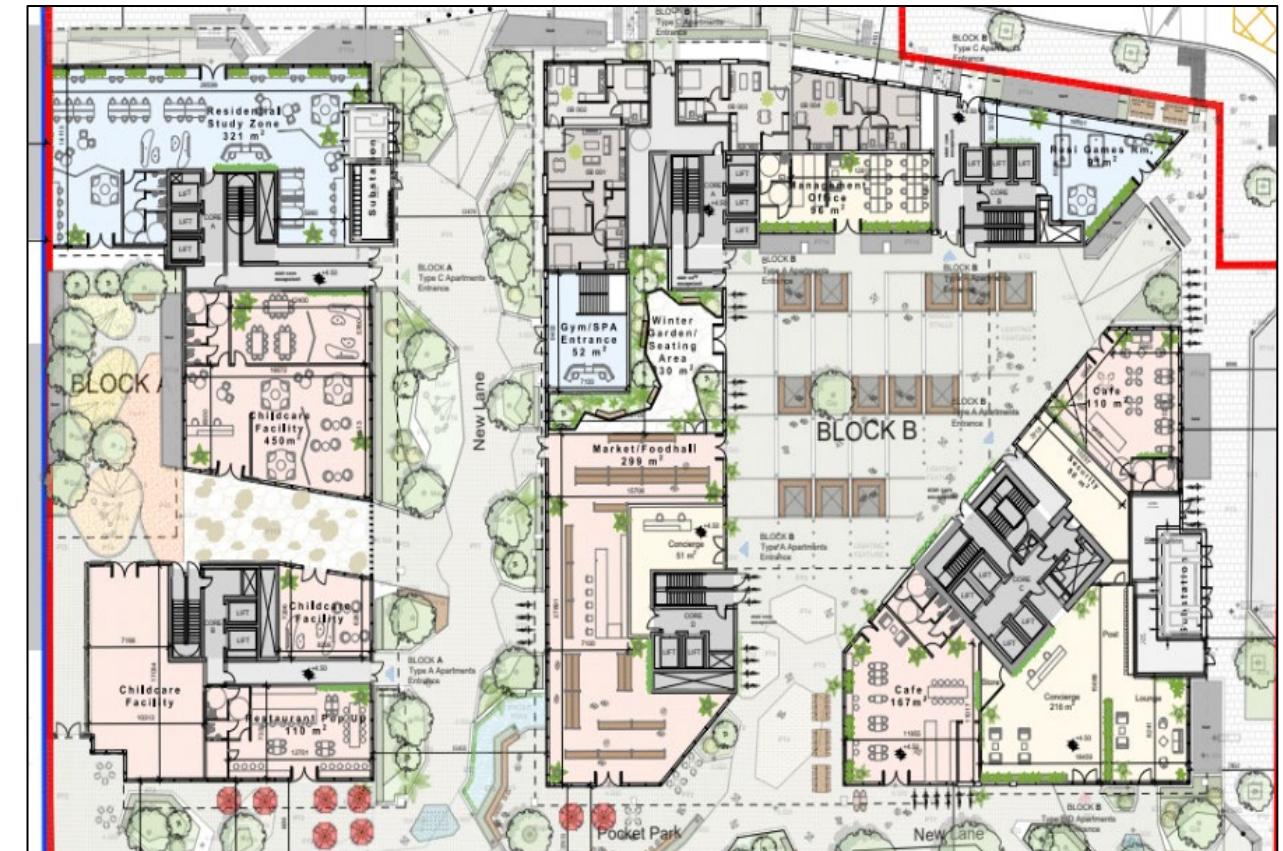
Excerpt from Ground Floor Plan, showing the various uses with active frontage at street level (Source: Drawing No. P1010, Revision 6 by Henry J Lyons Architects.)
